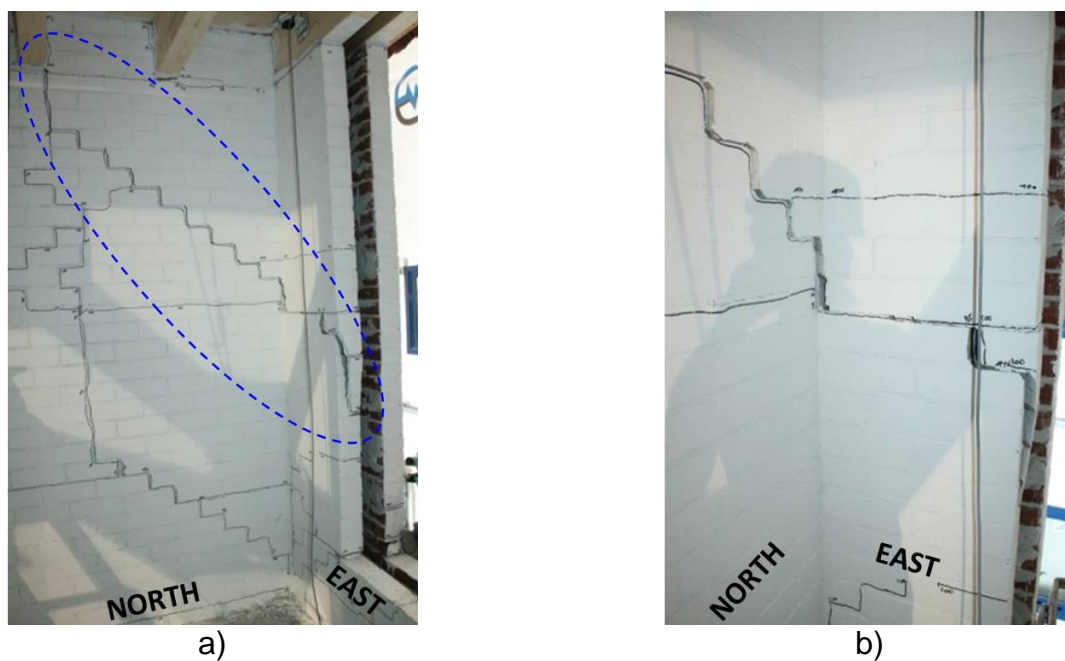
Crack C13 after EQ-NPR 100%: a) overview; b) North-East walls intersection.
